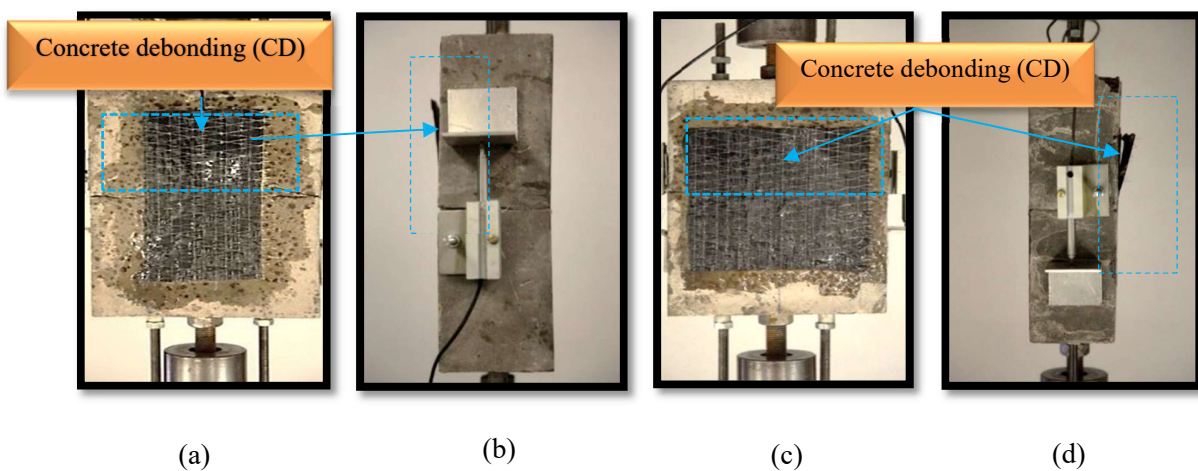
Typical failure in the concrete prism (CF) in LWAC and NWAC specimens (a) Front view of LWAC specimen, (b) Side view of LWAC specimen, (c) Front view of NWAC specimen, (d) Side view of NWAC specimen.
